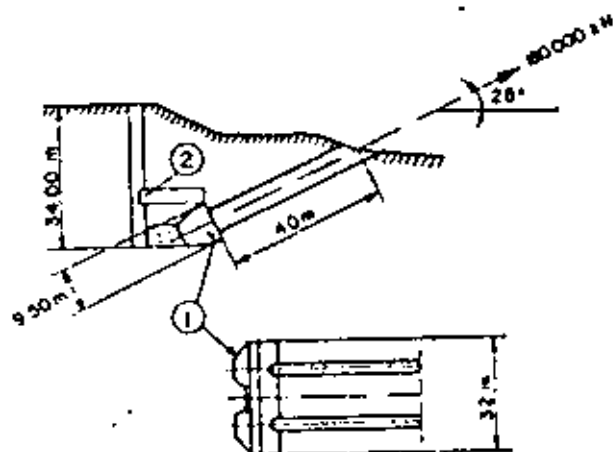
Anchorage of Tancarville suspension bridge. Right bank (Faquillan, 1961).
